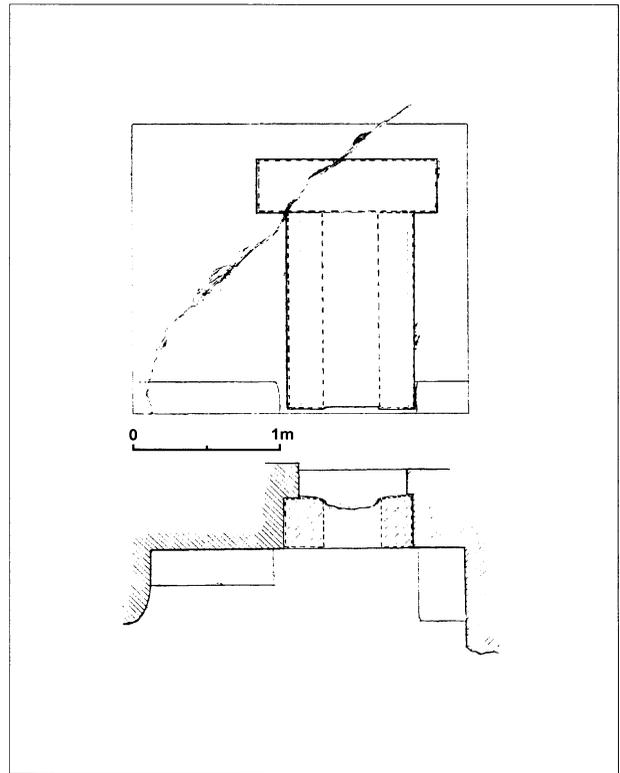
Restituted elevation and section of tomb 31 (drawn by: N. Çevik)
